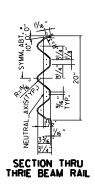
DETAILS SHOWING POSITION OF GUARDRAIL ON HIGHWAY
